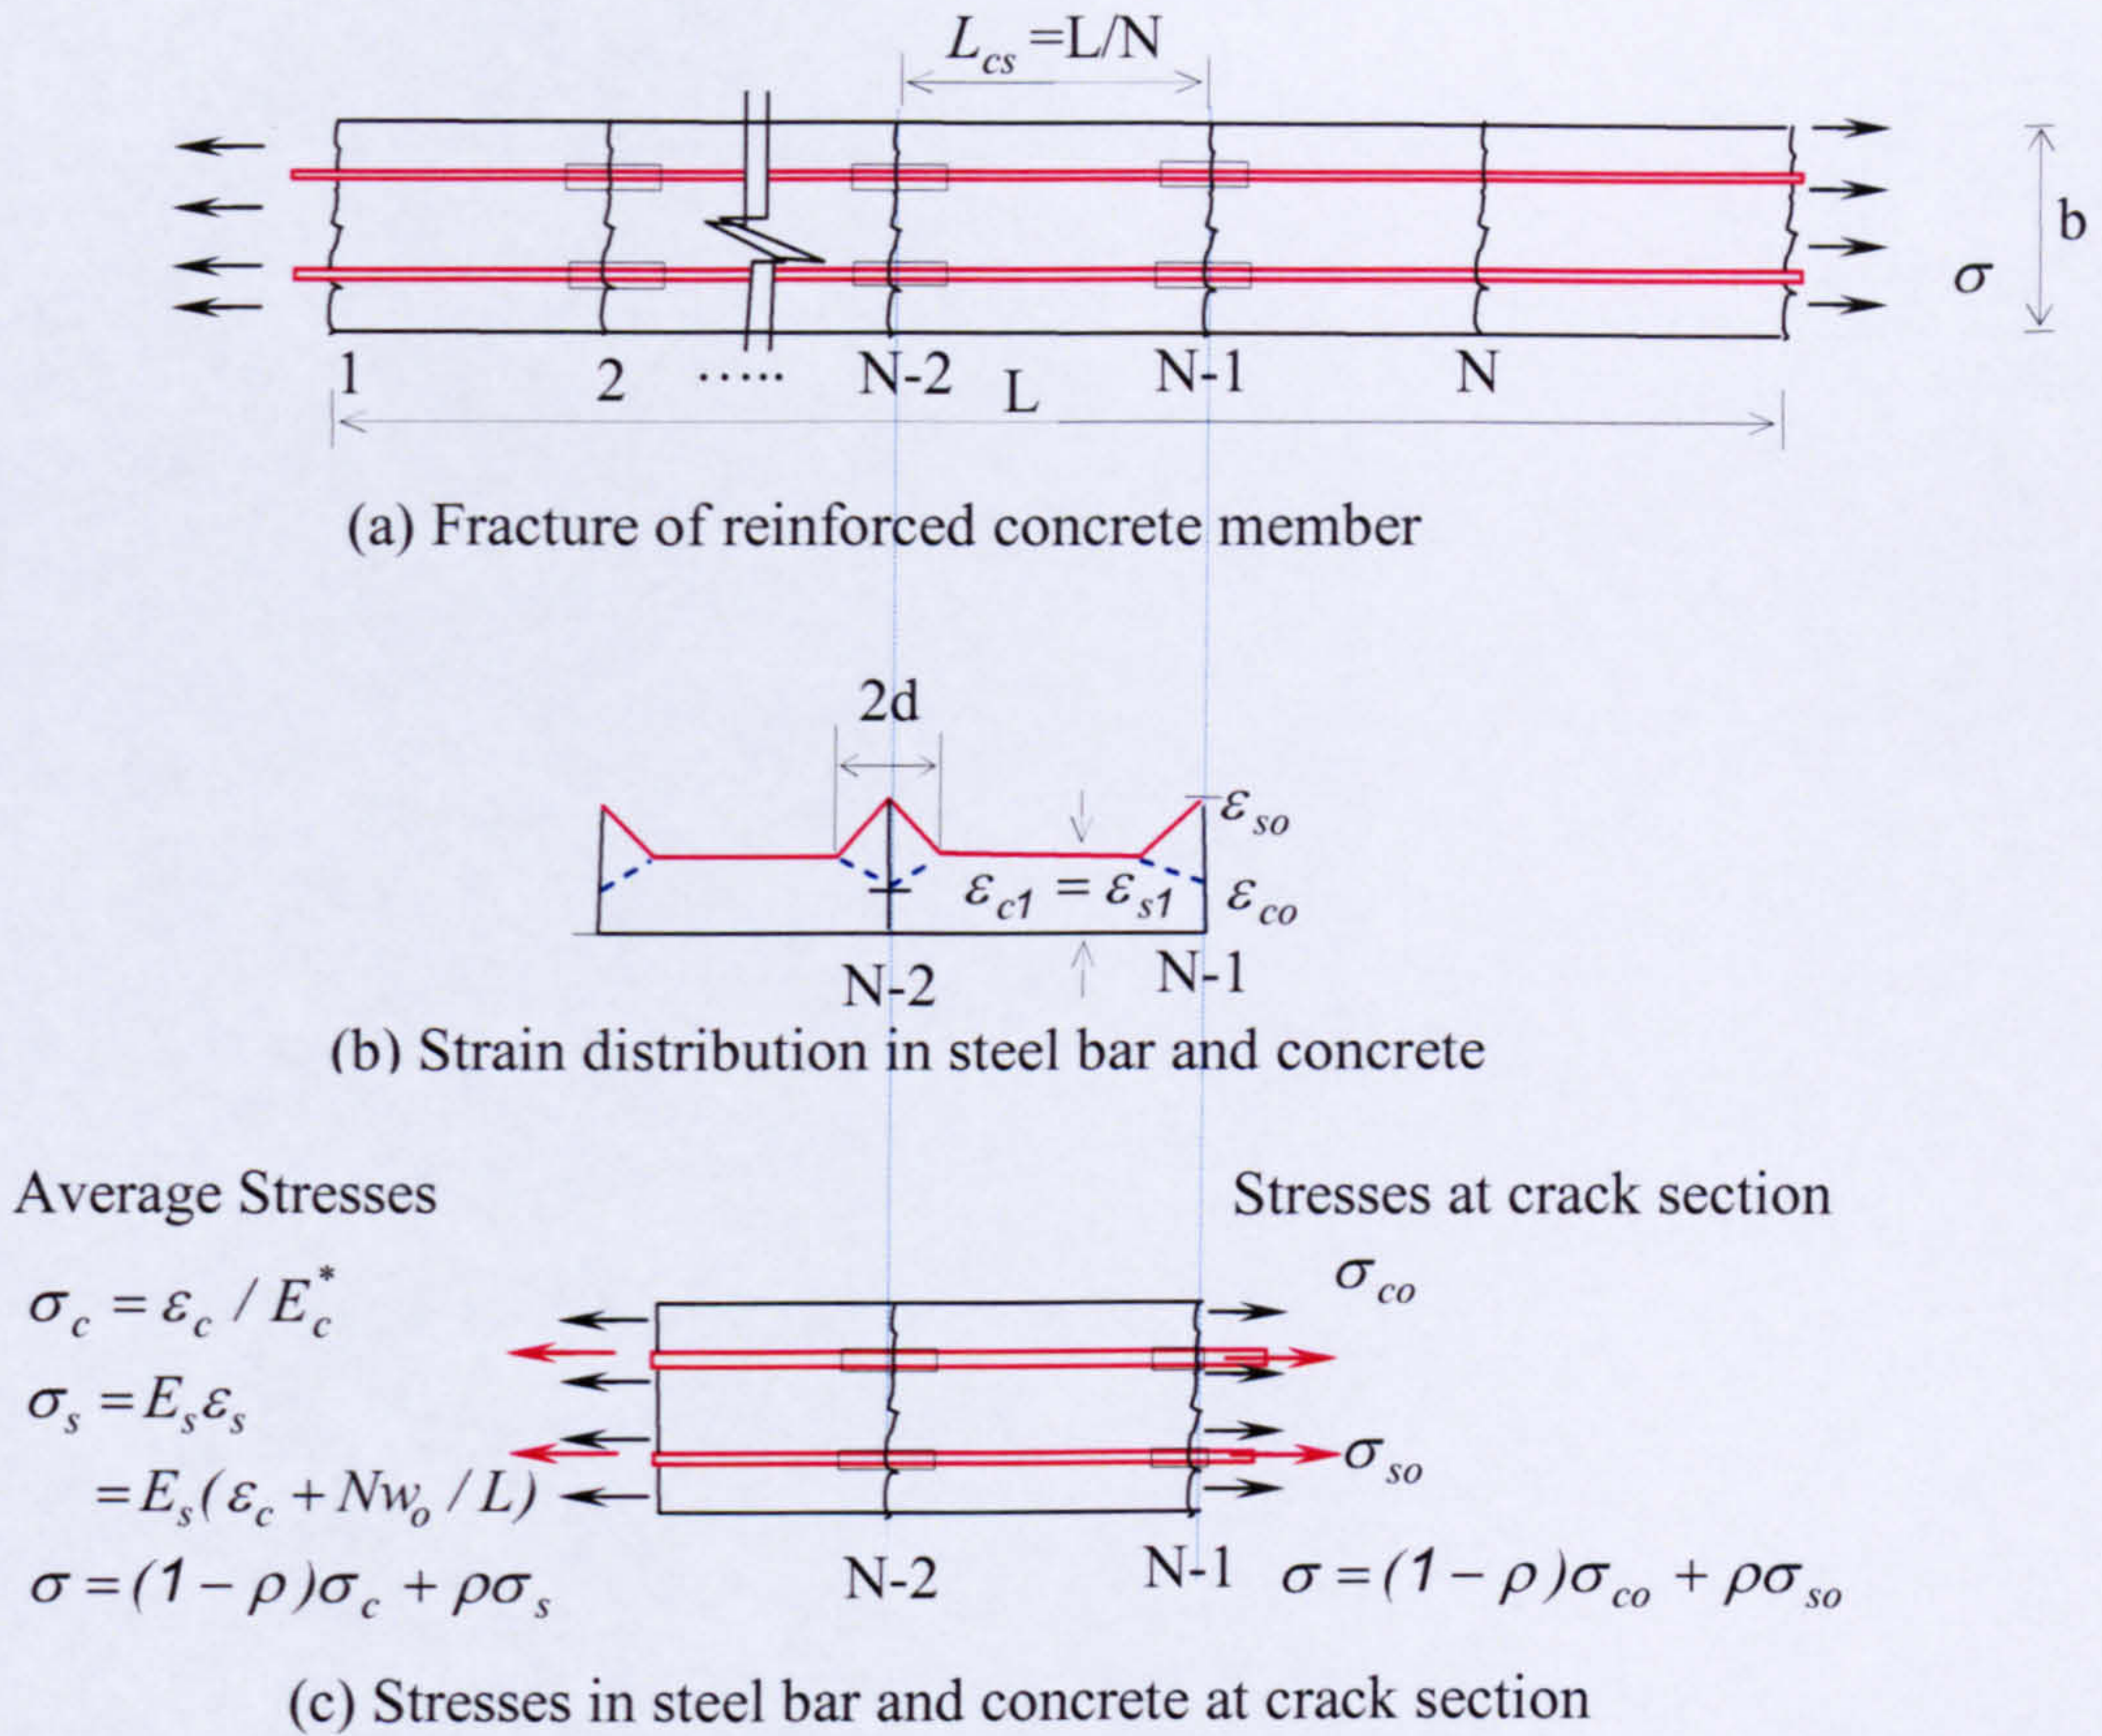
Idealized fracture approach for reinforced concrete in tension (Ouyang and Shah 1997)
